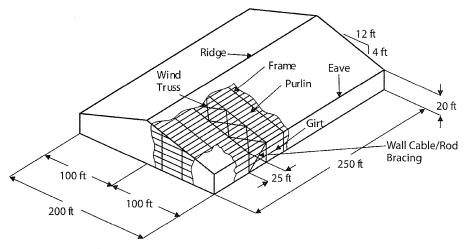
Dimensions and Framing of the Building of Examples 6 and 7
